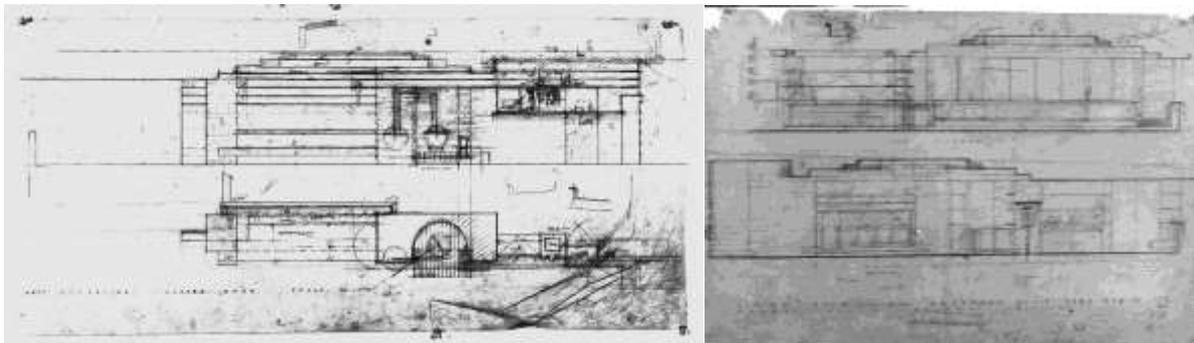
living room South elevation east elevation* Columbia FLLW 3602 p. 72 et 137
